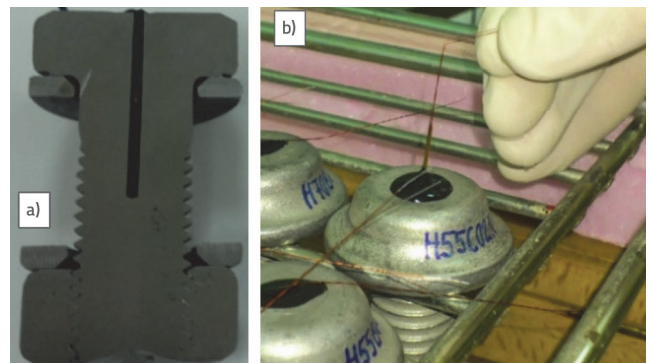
a) Positioning strain gauge in HV bolt; b) embedding rectangular bended strain gauge into HBT bolts
